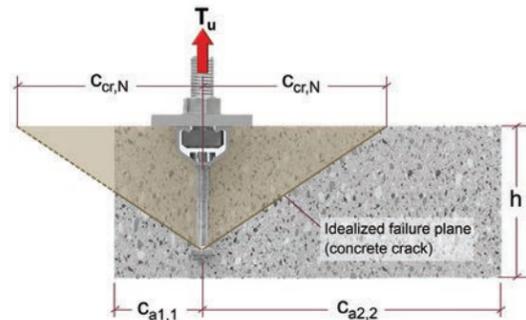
Idealize failure plane in concrete due to tension forces.
